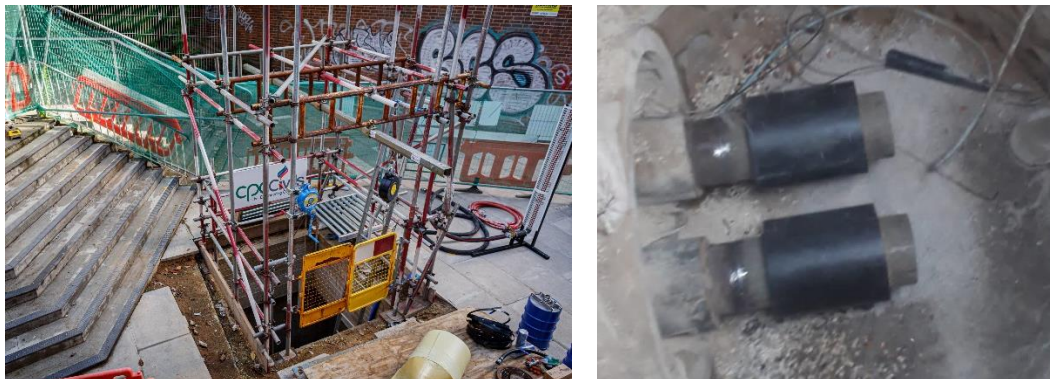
New chamber installation on Flat Street and new 1m pieces of District Heating pipes installed on Norfolk Street.
